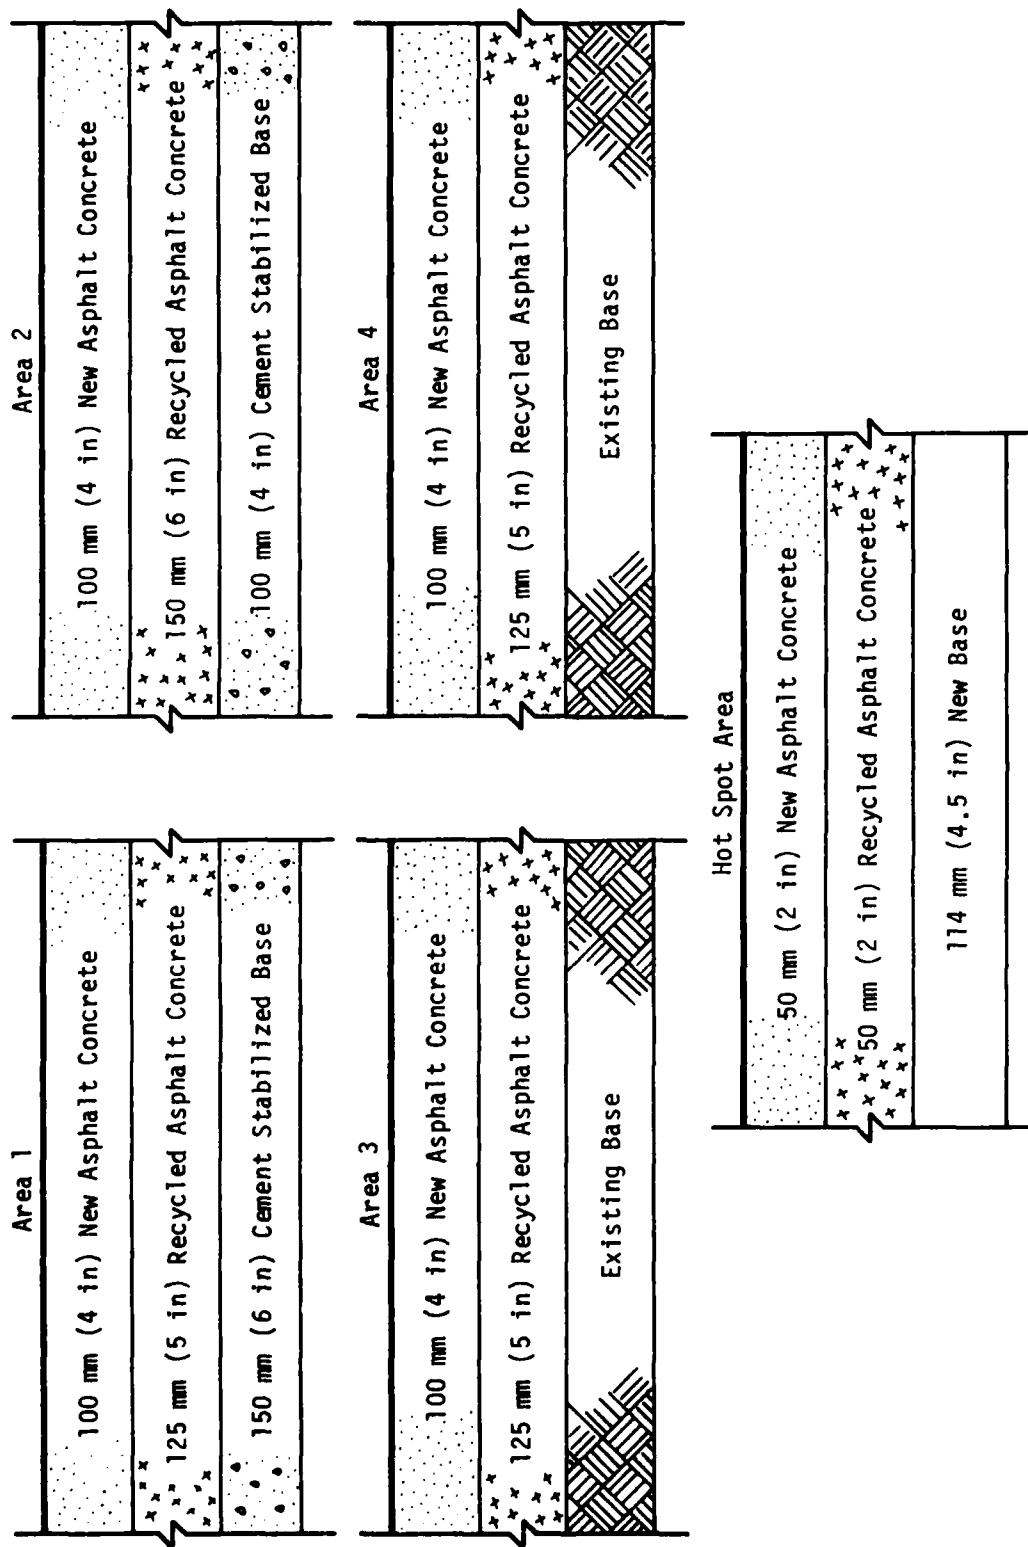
Cross Sections Proposed for Recycled Asphalt Pavements at Pope Air Force Base
